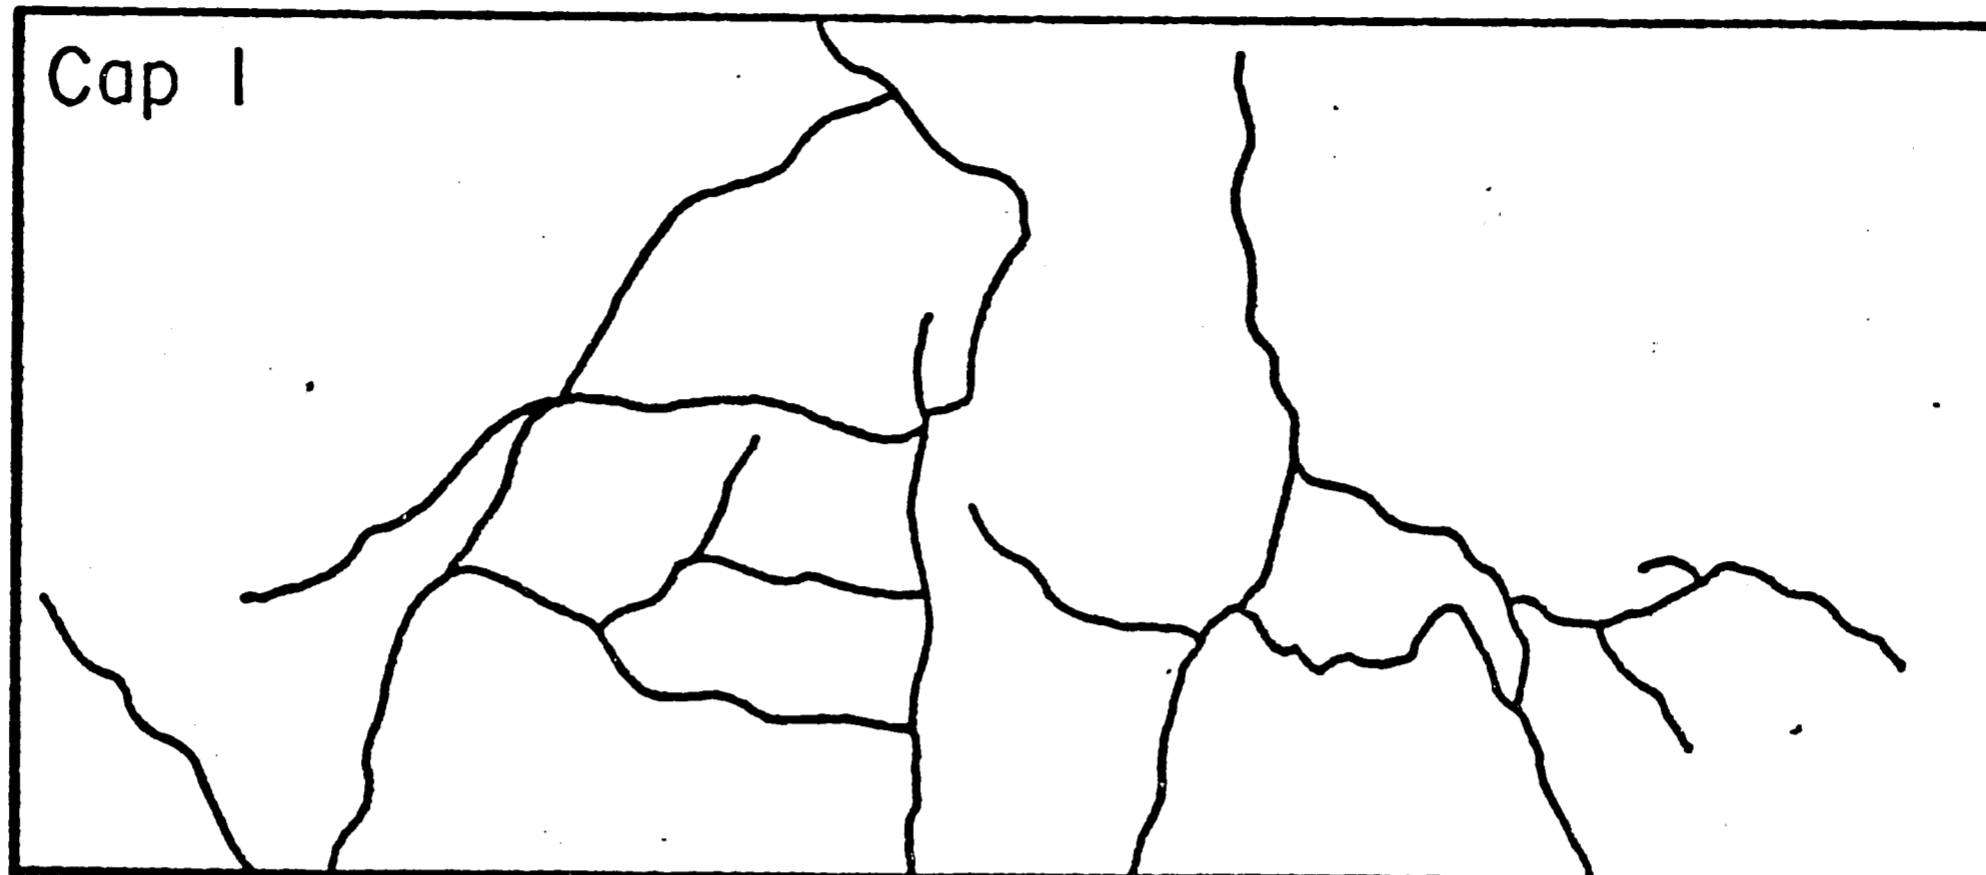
SOUTH FACE OF PILE CAP 1 - CRACK PATTERNS
